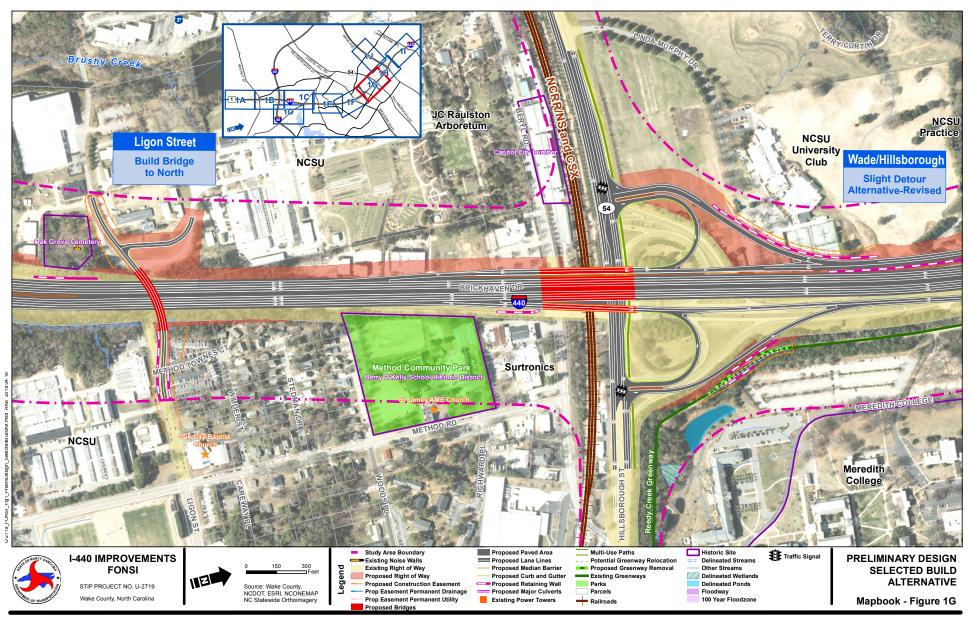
Hillsborough St & Wade Ave Interchanges - Slight Detour Alternative-Revised
